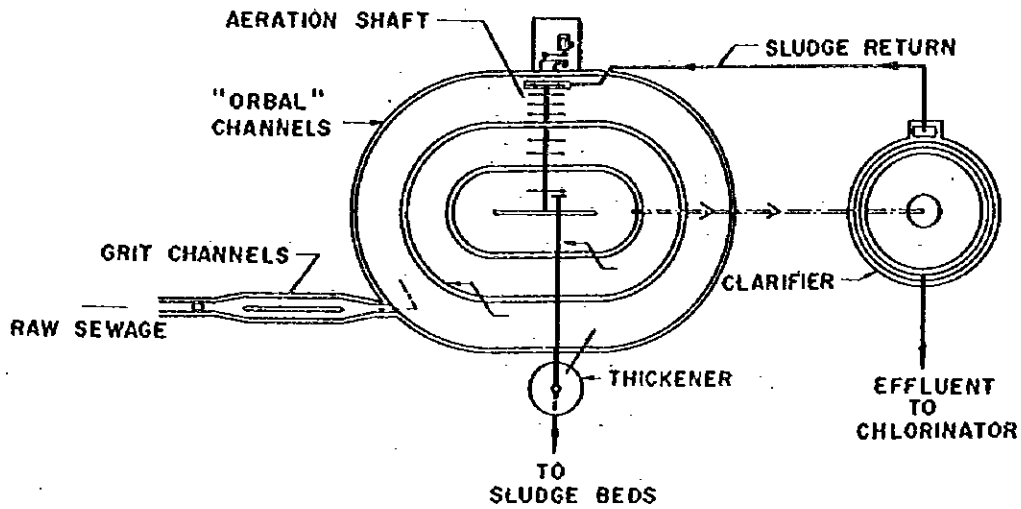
8 PLAN OF SEWAGE TREATMENT PLANT
